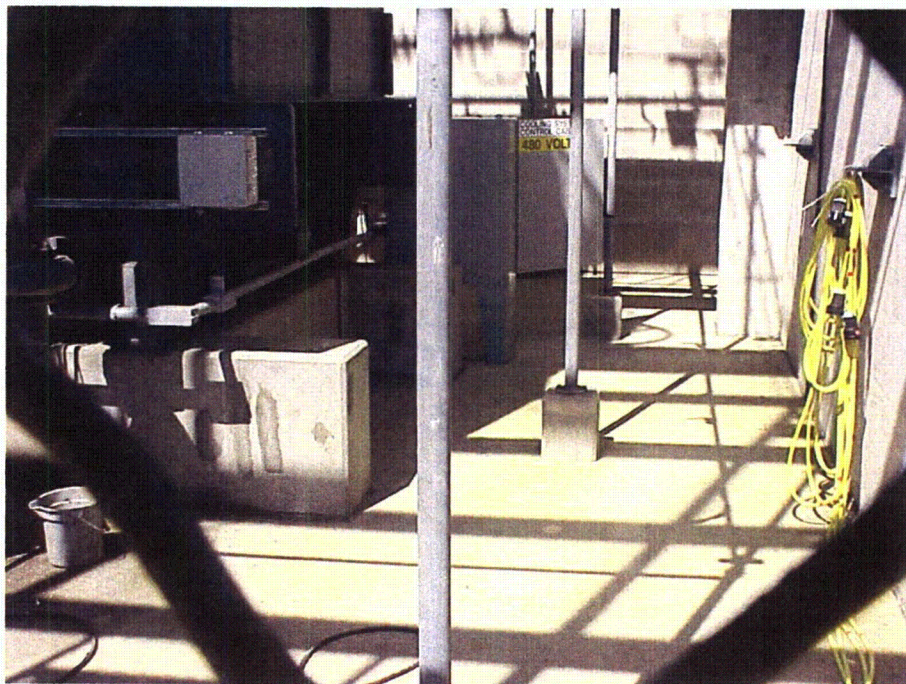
Contained Dominion Transformer Areas Outside Turbine Building
